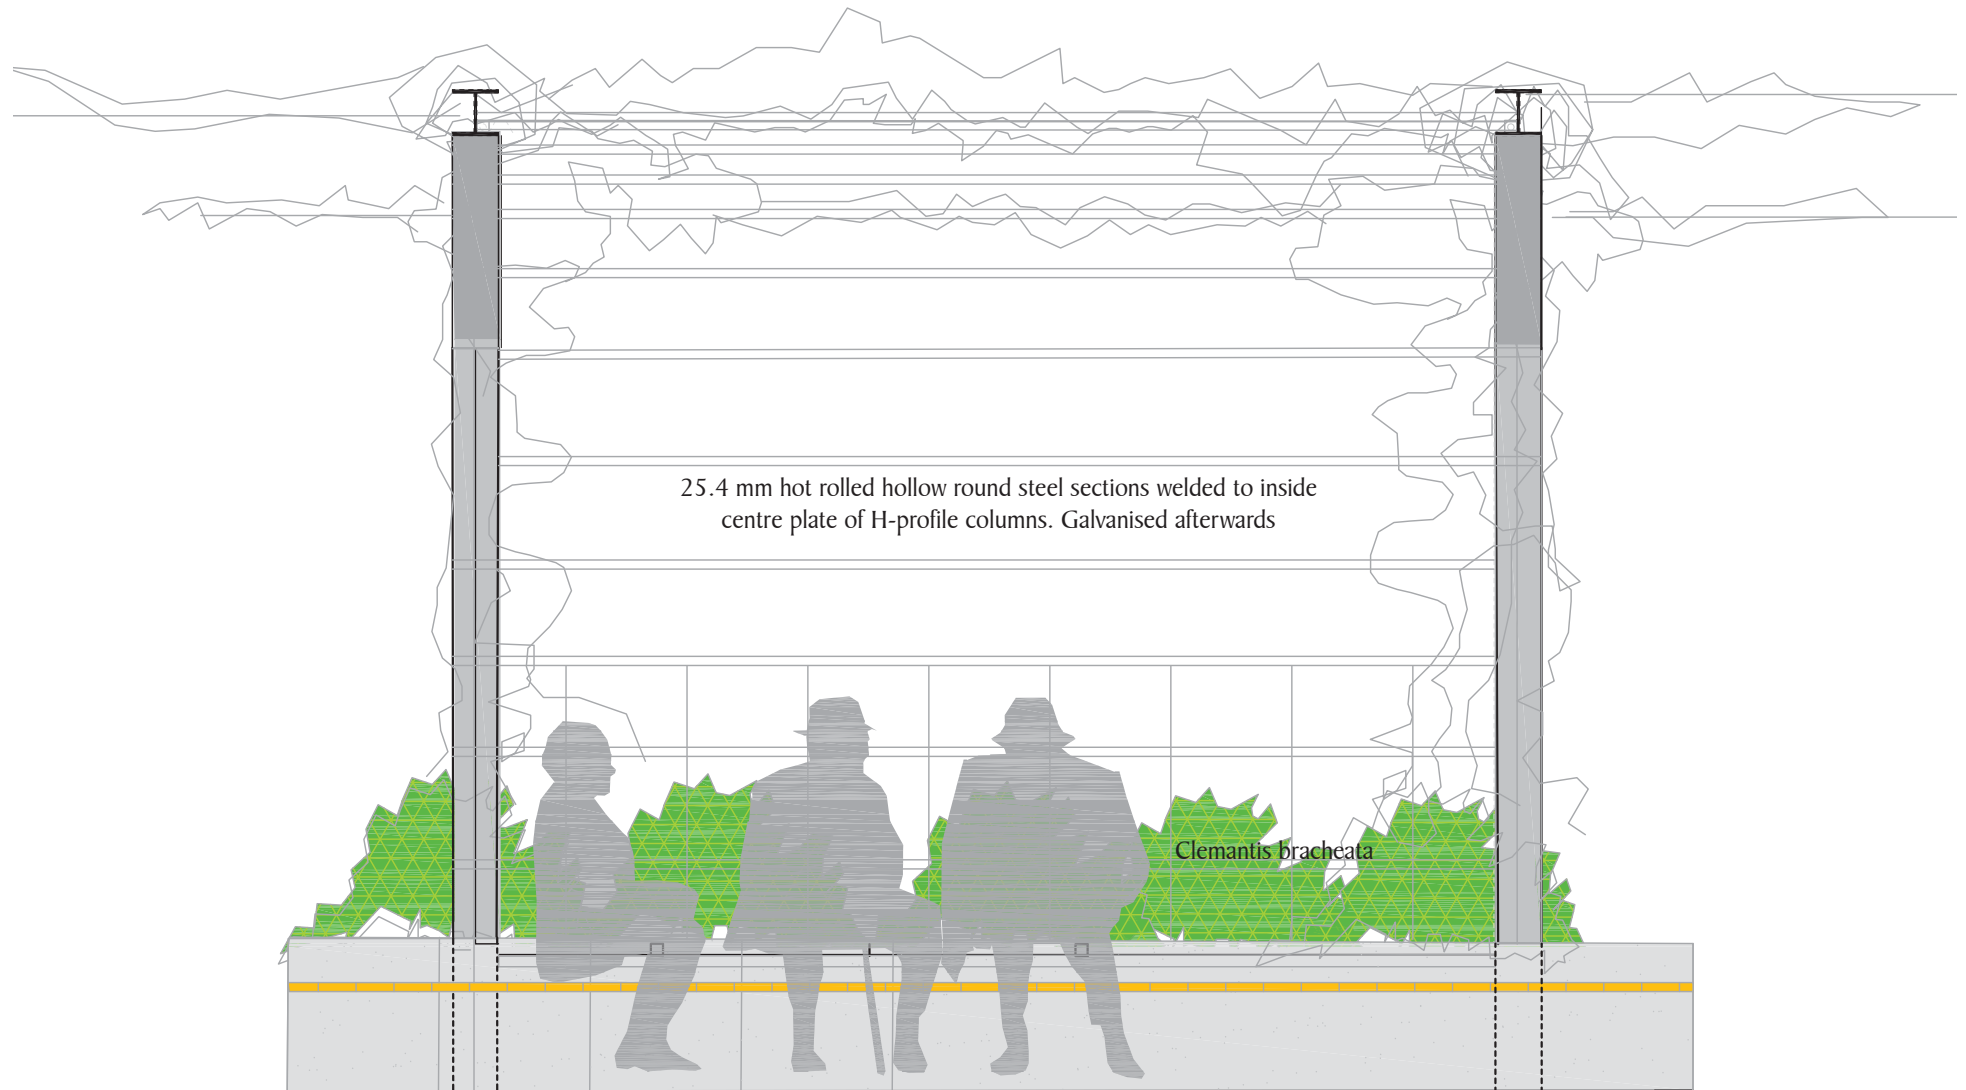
Trellis. Elevation. Scale 1:25 (Author, 2008)
